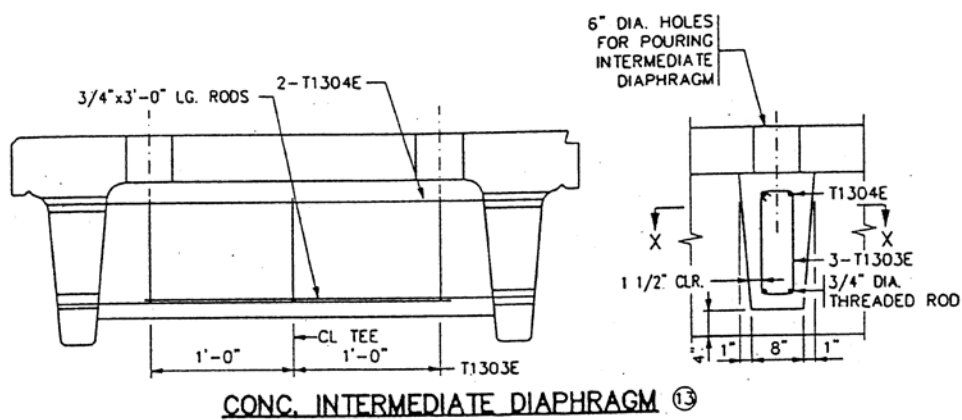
Typical cast-in-place intermediate concrete diaphragm for Double-Tee girders
